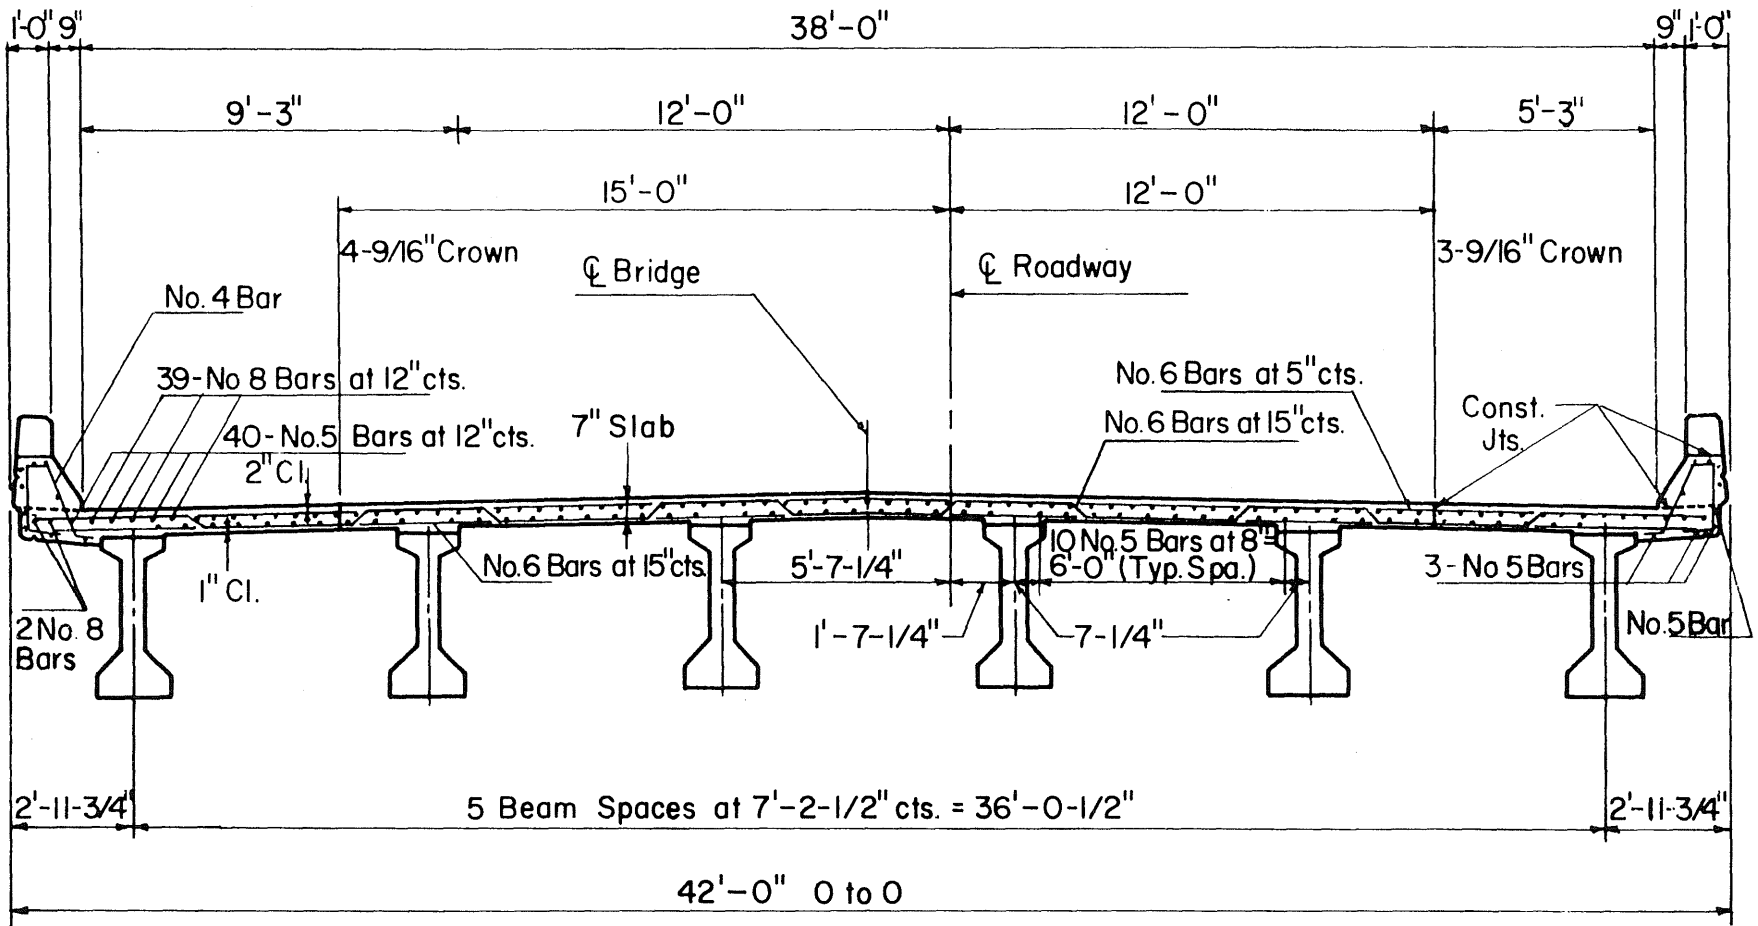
BRIDGE CROSS-SECTION NEAR PIERS
